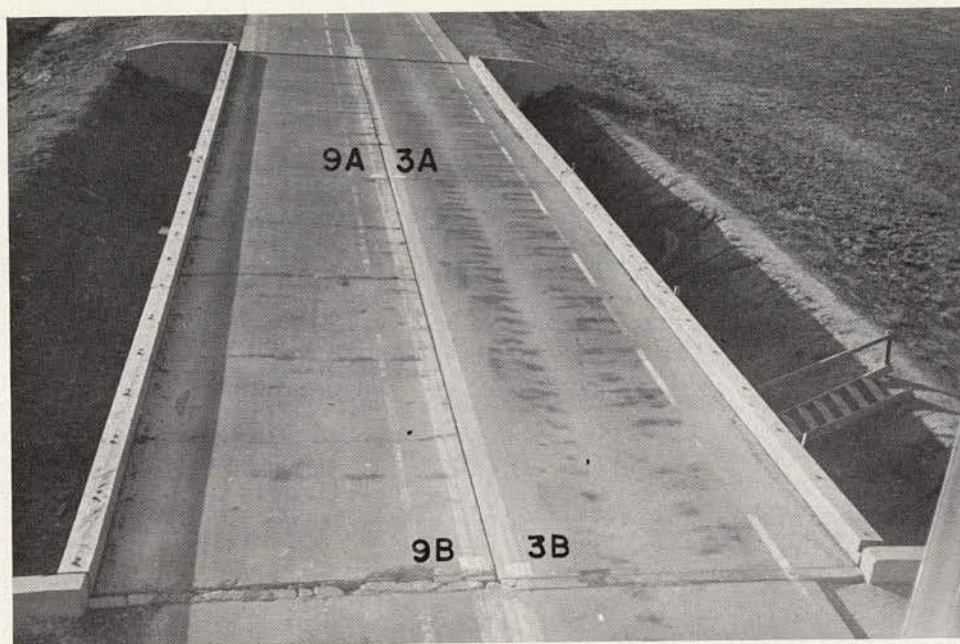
Bridge slabs on west end of Loop 6 at end of test traffic.
